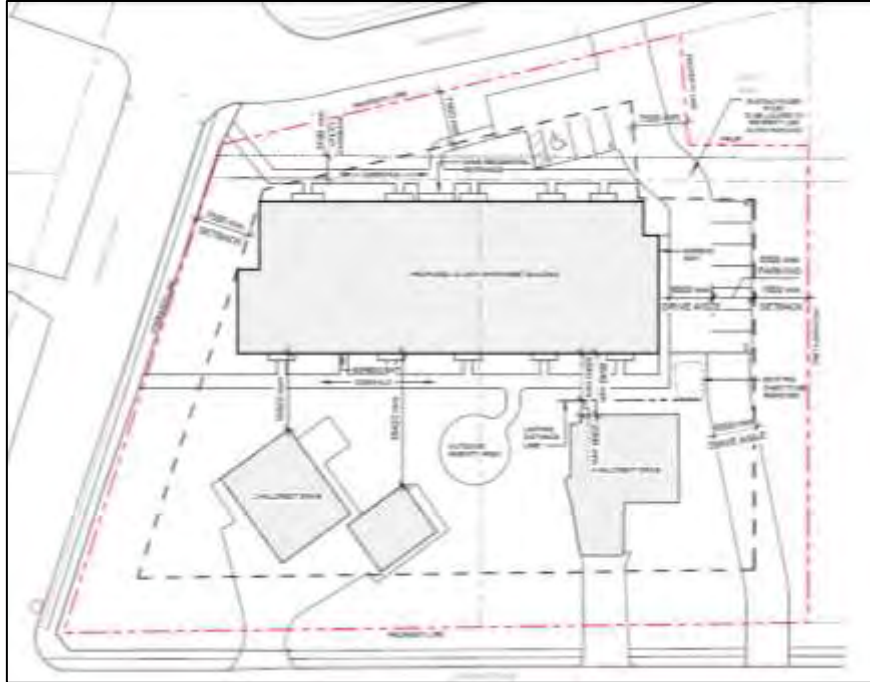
Proposed Site Plan (41 unit apartment building and 2 single-family dwellings)
